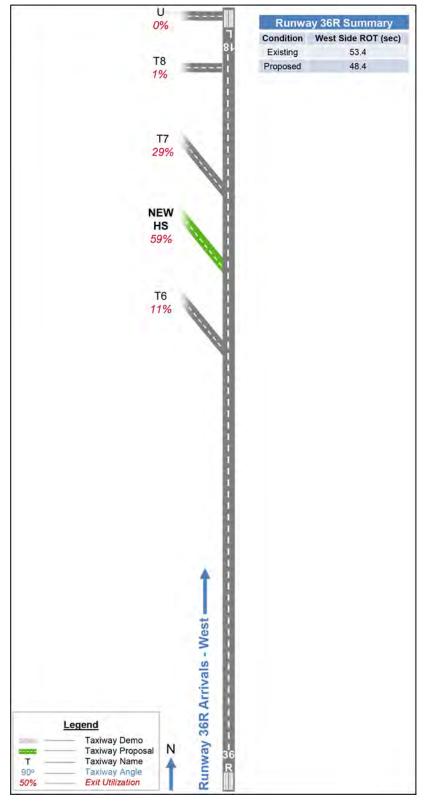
RUNWAY 36R POTENTIAL EXIT IMPROVEMENTS
